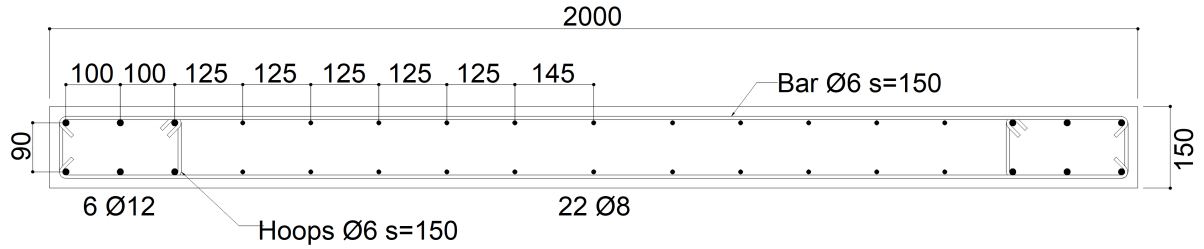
WSH4: Cross section and reinforcement detailing [Unit: mm].
